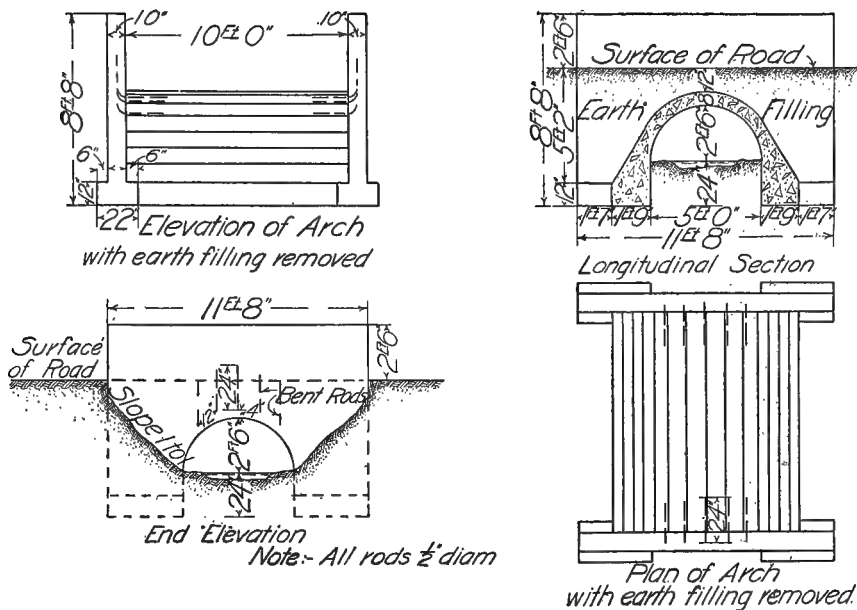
ARCH CULVERT FOR FIVE-FOOT SPAN.
